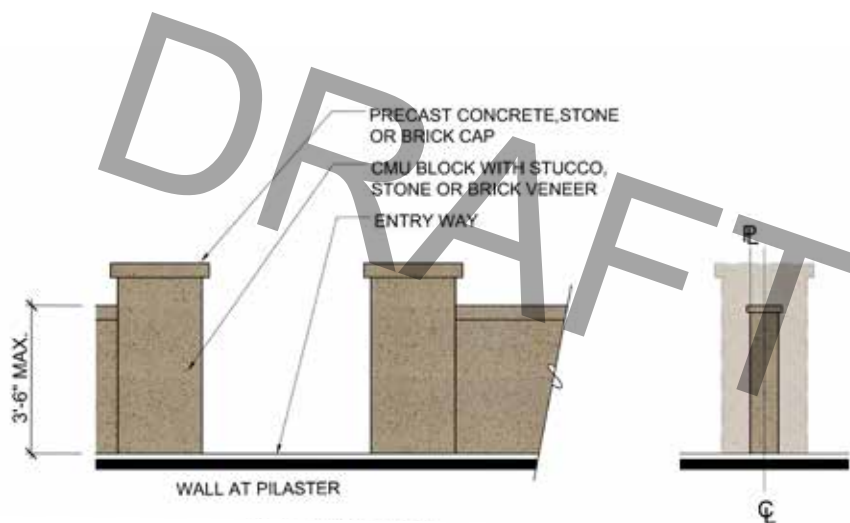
RESIDENTIAL FRONT YARD LOW WALL
